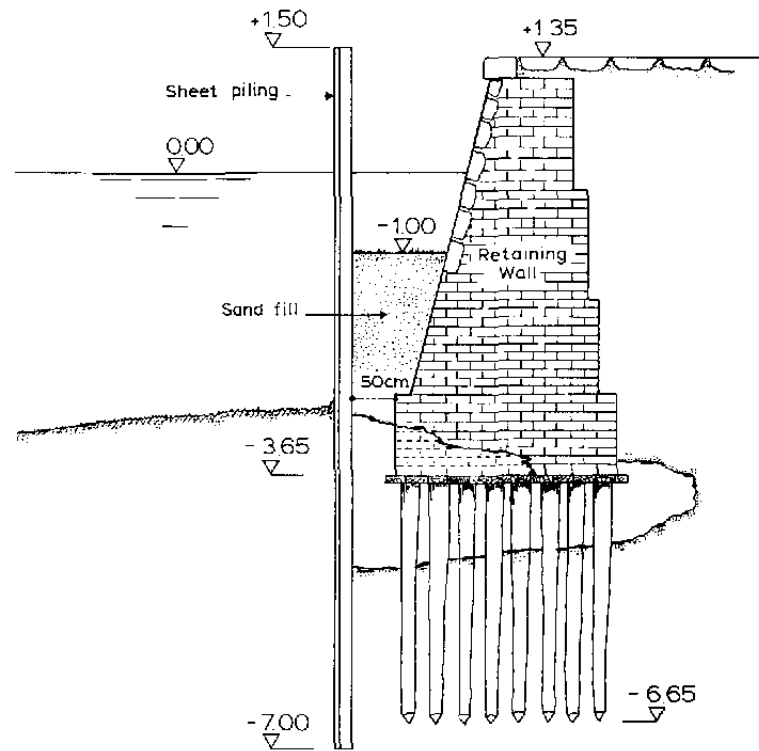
Temporary strengthening of retaining wall by sheet piling.
